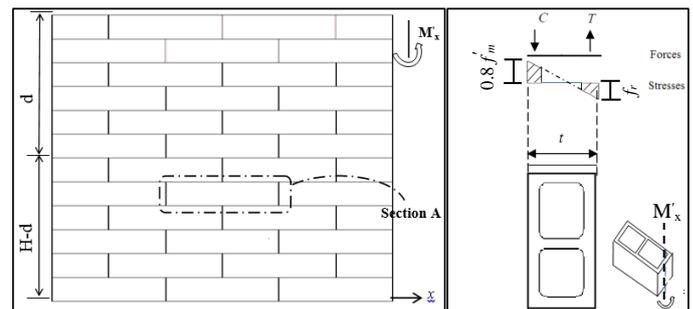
Typical Masonry wall under the action of M_x or M'_x
